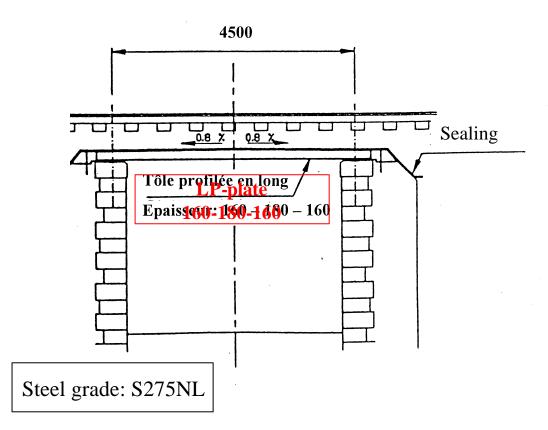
Bridgebuilding with heavy plates, Pont de Moyaz, CH
